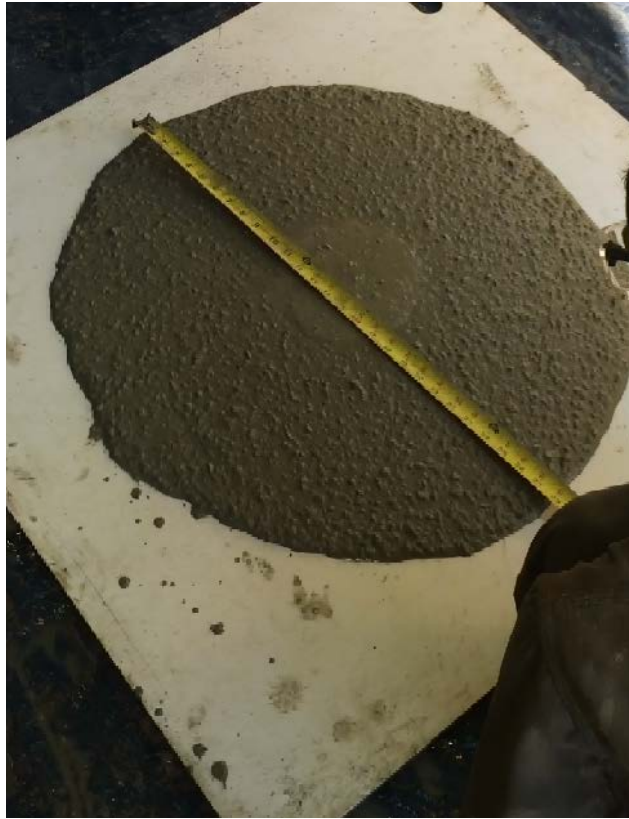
Slump flow of the SCC used in the second batch for the box girder specimen
